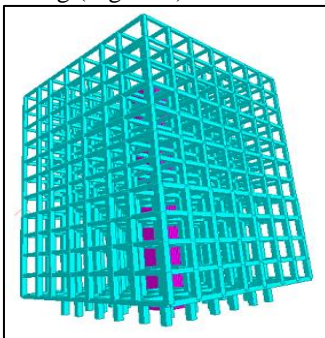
Floating column at outer periphery and shear wall at center of the building
